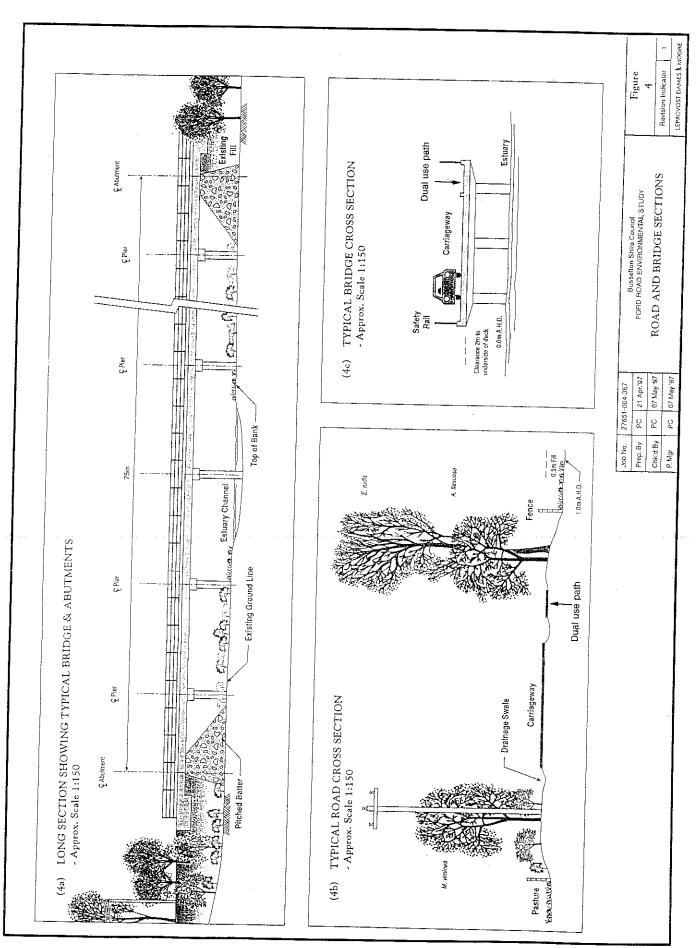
Design details of proposed bridge to be incorporated within the revised Ford Road proposal.
